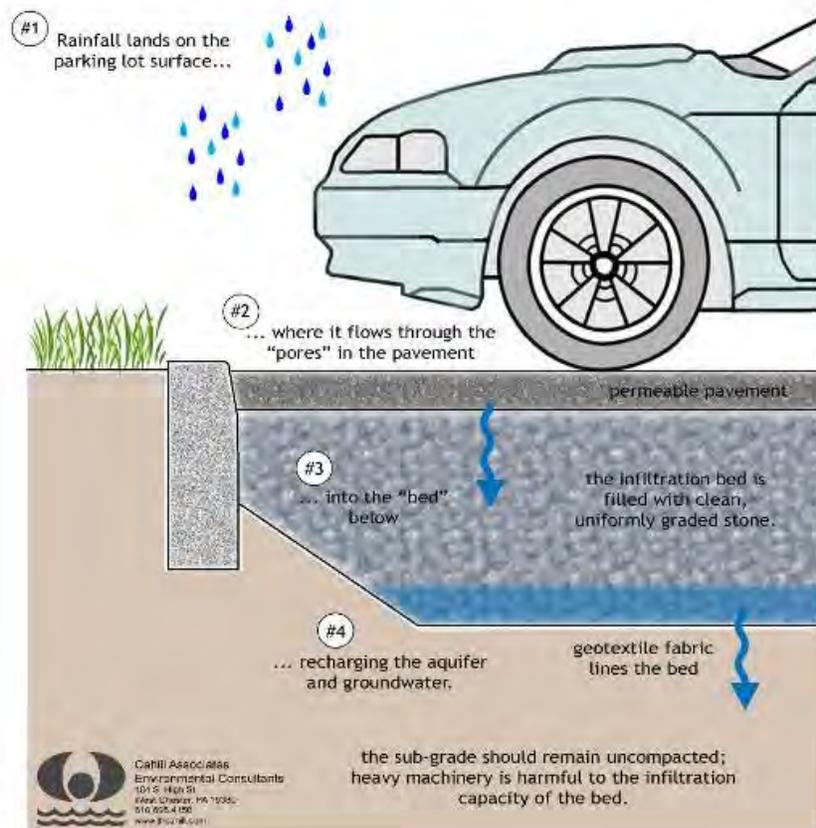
Cross-section showing design components of permeable pavement with subsurface infiltration bed.
